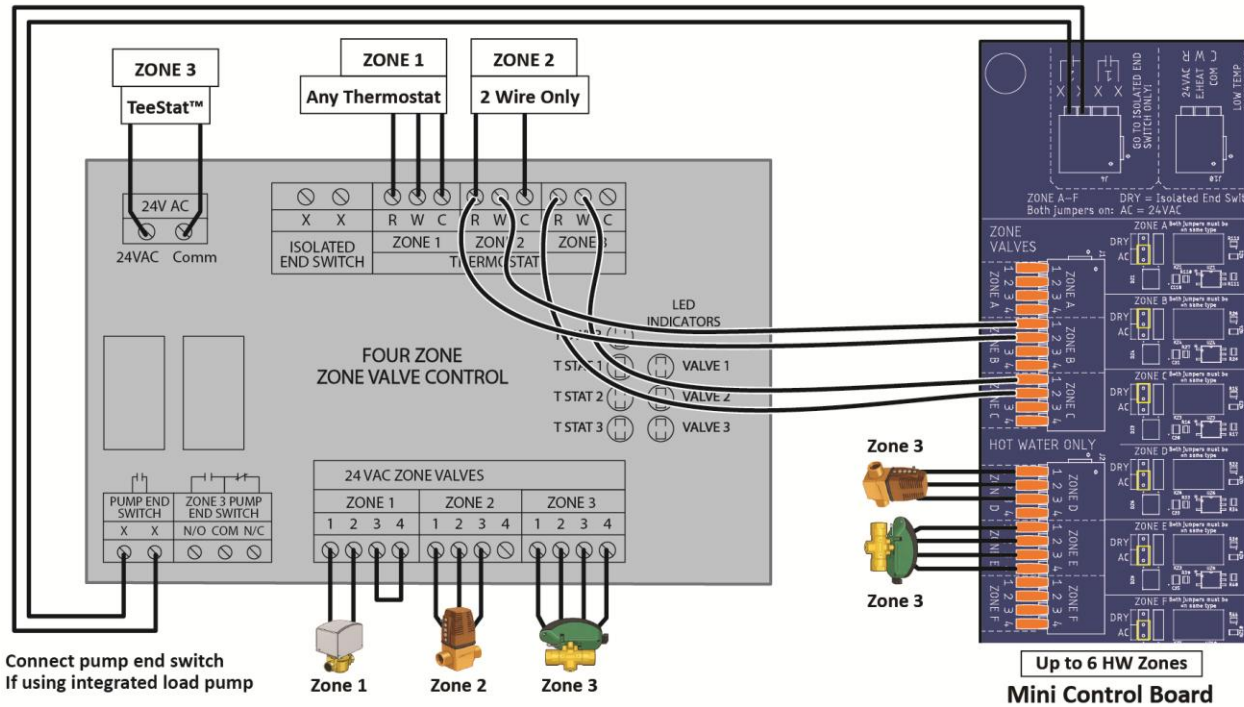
Wiring options for thermostats with zone valve control board and mini control board
